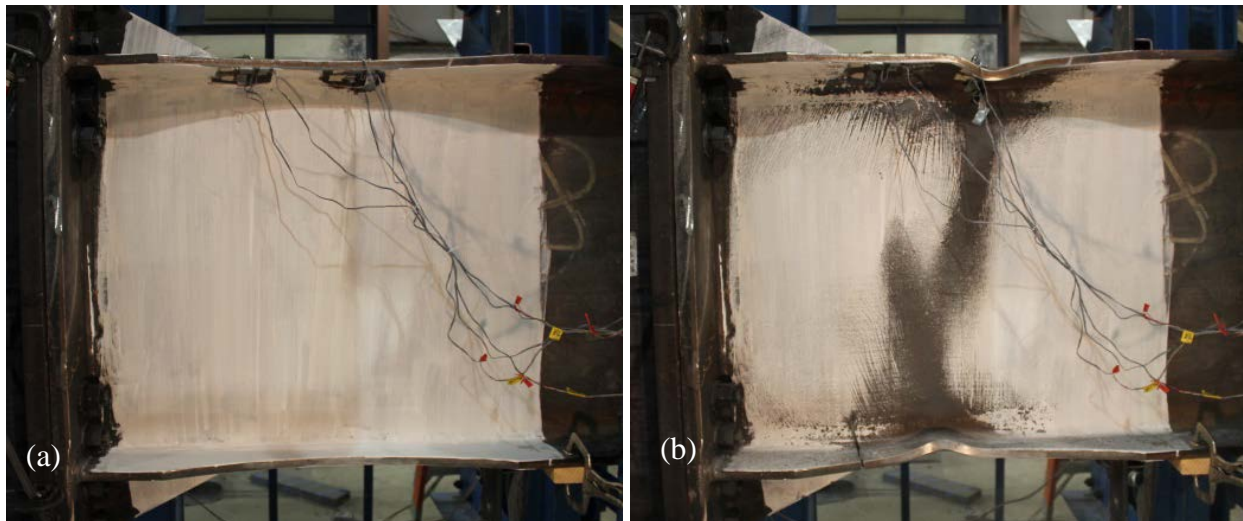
Side View Pictures of Specimen 8 (W36x150 with RBS and Puddle Welds) at (a) Start of Test, and (b) Final Deformation
